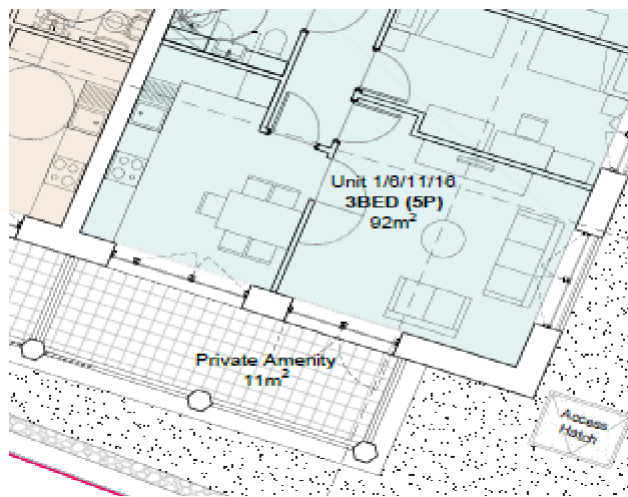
Extract of first to fourth floor, where kitchen/diner falls short of ADF
